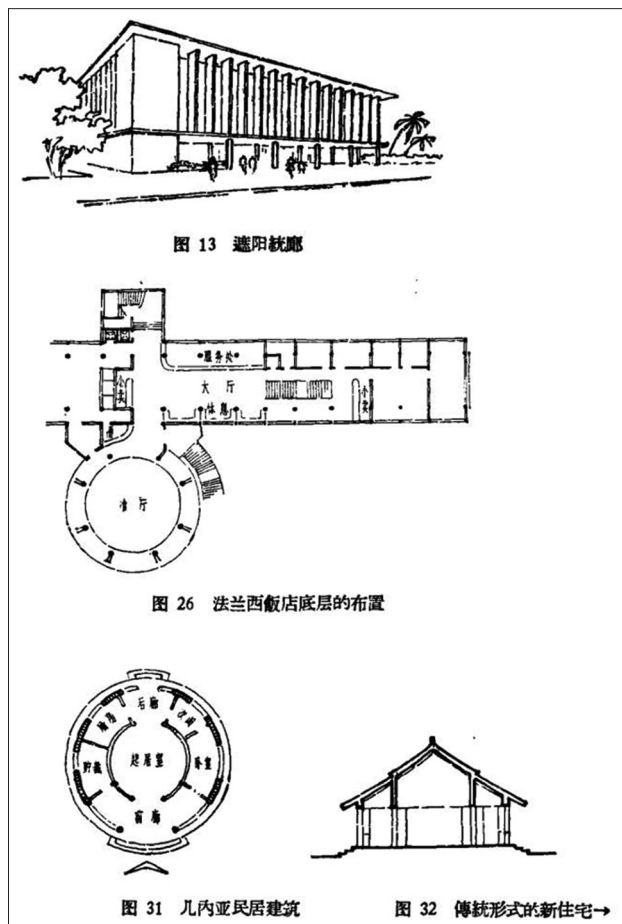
Illustrations in Chen's article on tropical architecture; modernist building with *brise-soleil* (up); the ground plan of the Grand Hotel de L'Indépendance (middle); plan and section of Guinean vernacular building (bottom). Source: *Jianzhu xuebao*, 1962, no. 10.
